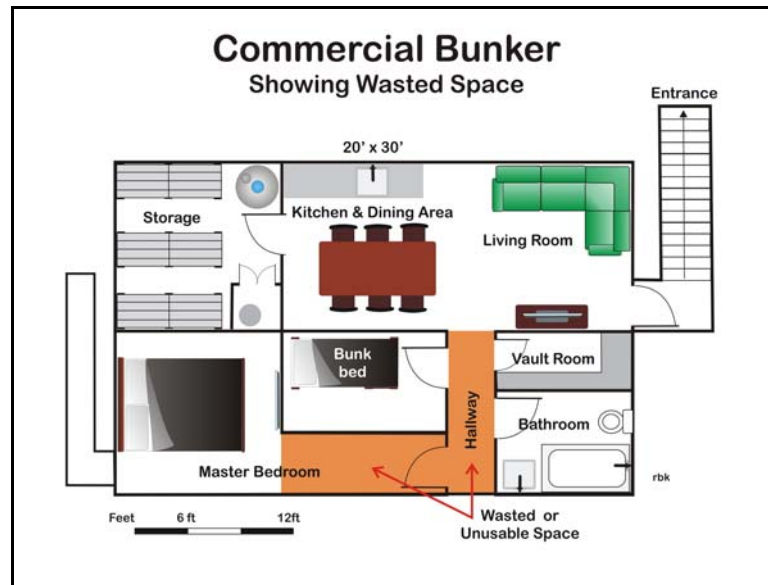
Bunker Floor Plan with Wasted Space – Examine spatial relationships and “walk-the-plan.” Hallways connect spaces and they may be an indication of wasted space in a confined area such as a bunker. Source: author – [file:\SH-Bunker02.cdr].
